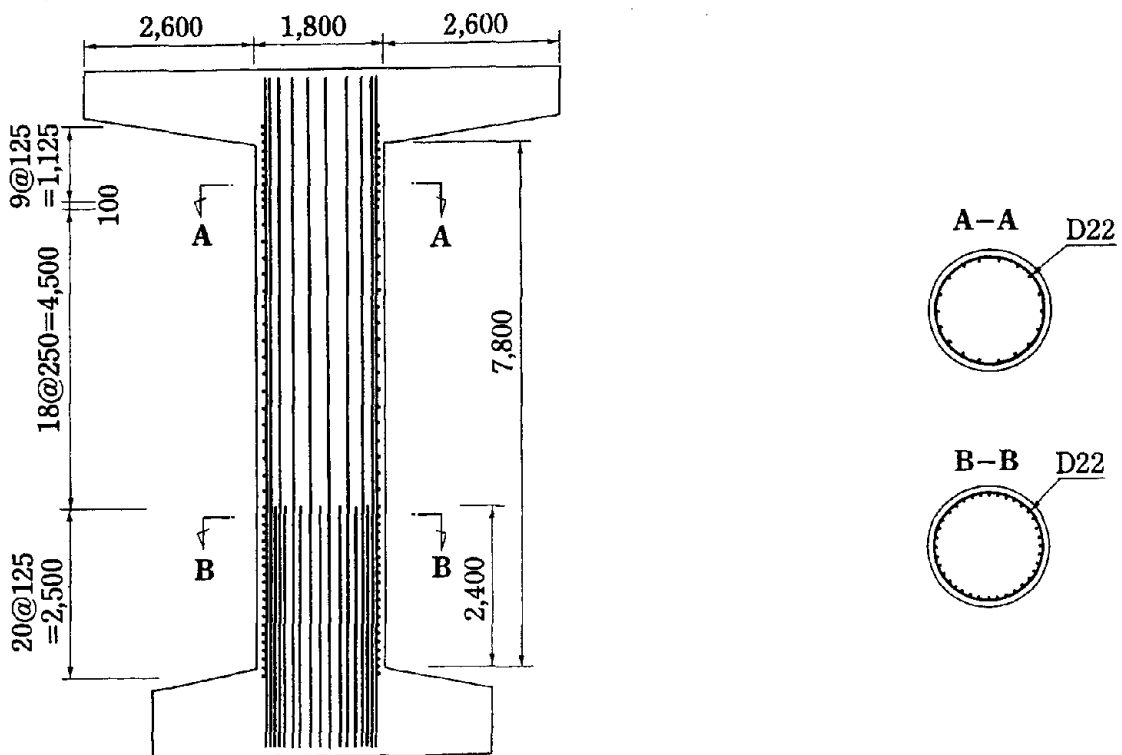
Layout of Longitudinal Reinforcement in Motoe Bridge Pier
